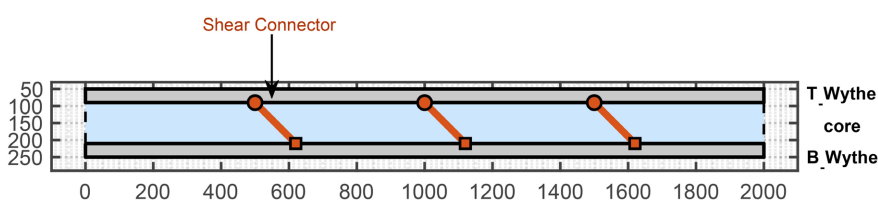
Cross-sectional view of a multilayer concrete sandwich panel showing key components and dimensions.
